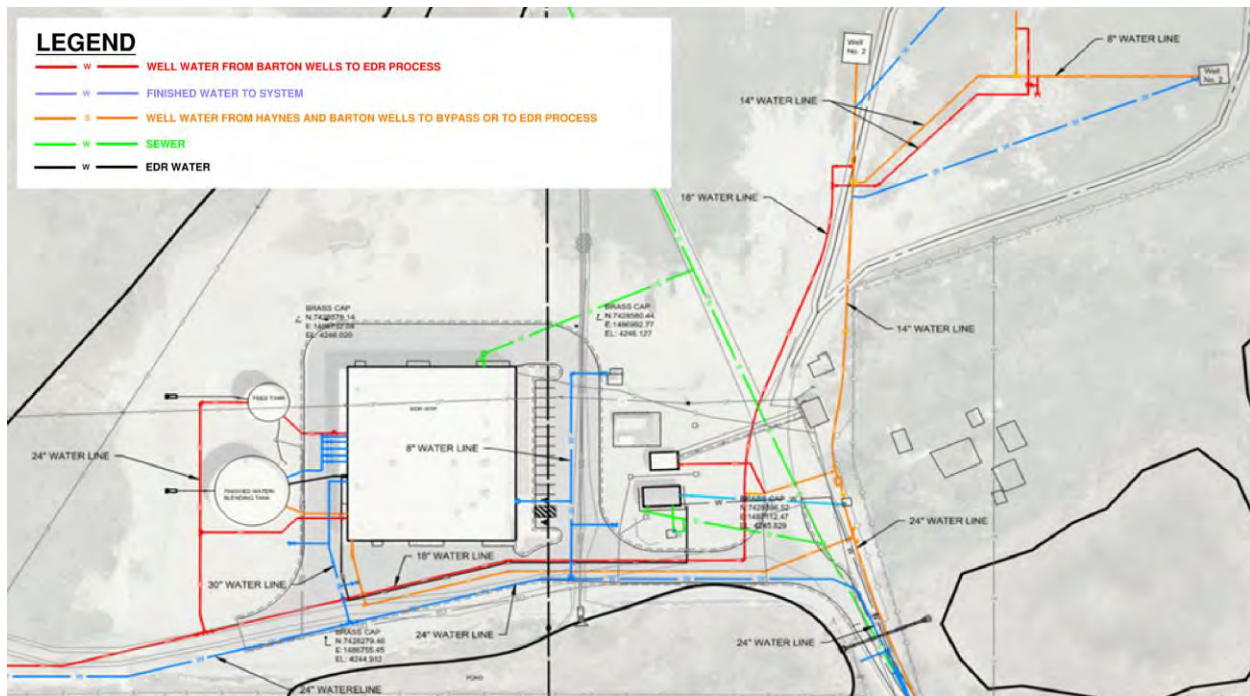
Existing EDR WTP Site Plan (Barton Record Drawings)
